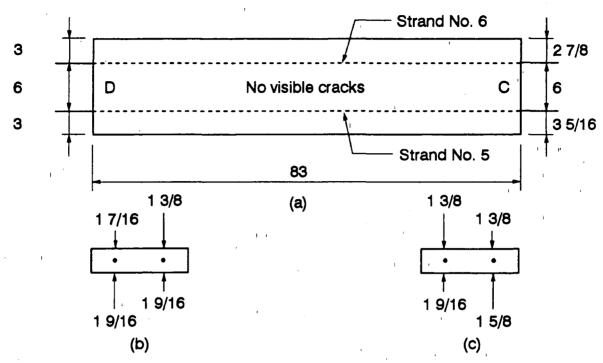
Specimen No. 2-3.0TC-9 (dimensions shown in inches):
